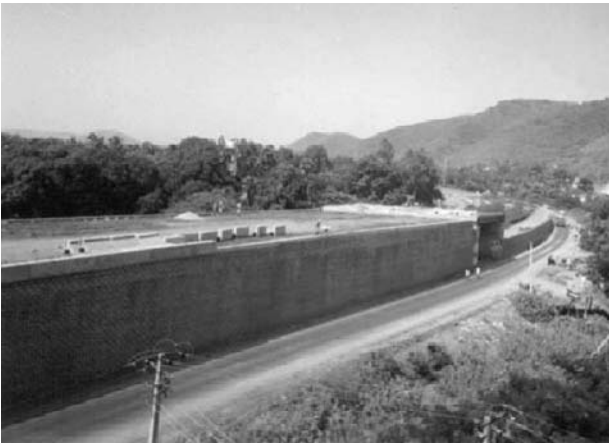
View of geogrid reinforced segmental retaining wall under construction at km 292+412m VUP of NH5, Dharmavaram-Tuni Package
